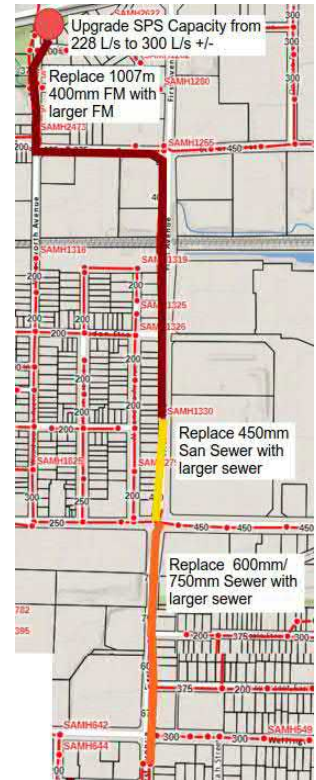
Upgrades required to Woodworth SPS and Downstream Collection System
